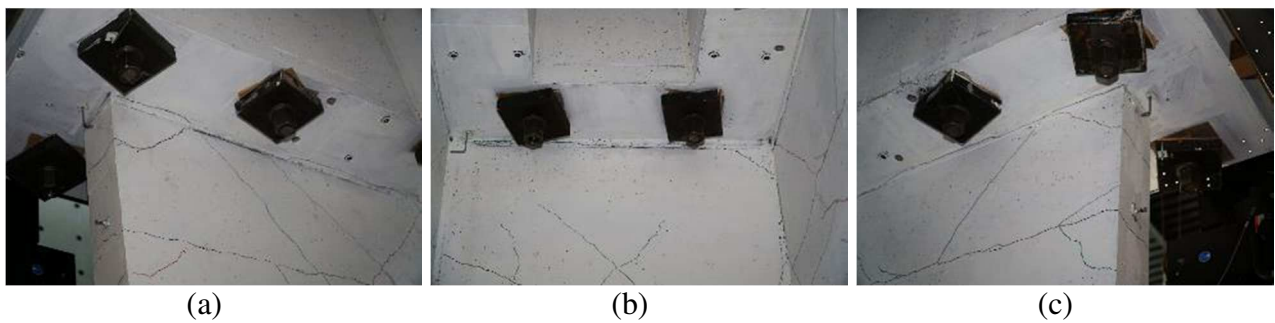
Crack patterns observed at the end of the tests on Original wall specimen: Top of the core wall (Mehmachi and Bouaanani, 2018)
